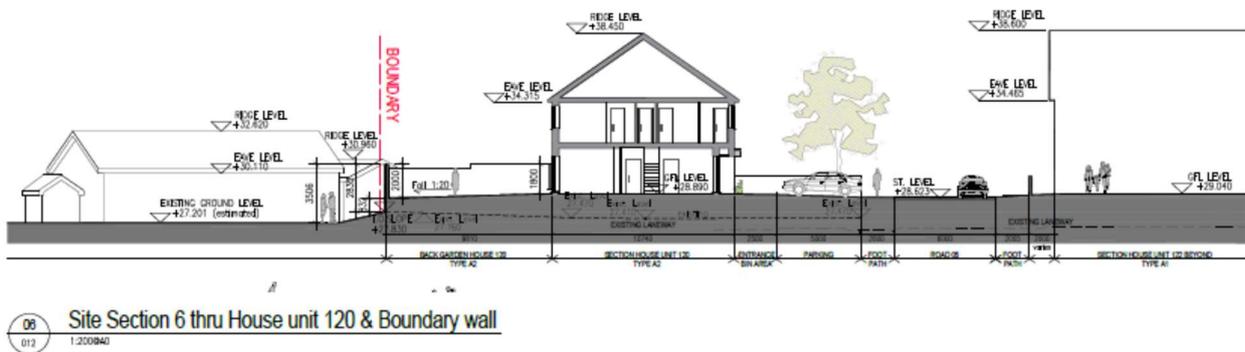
Site Section 06 taken from submitted drawing no. 6204-P012
